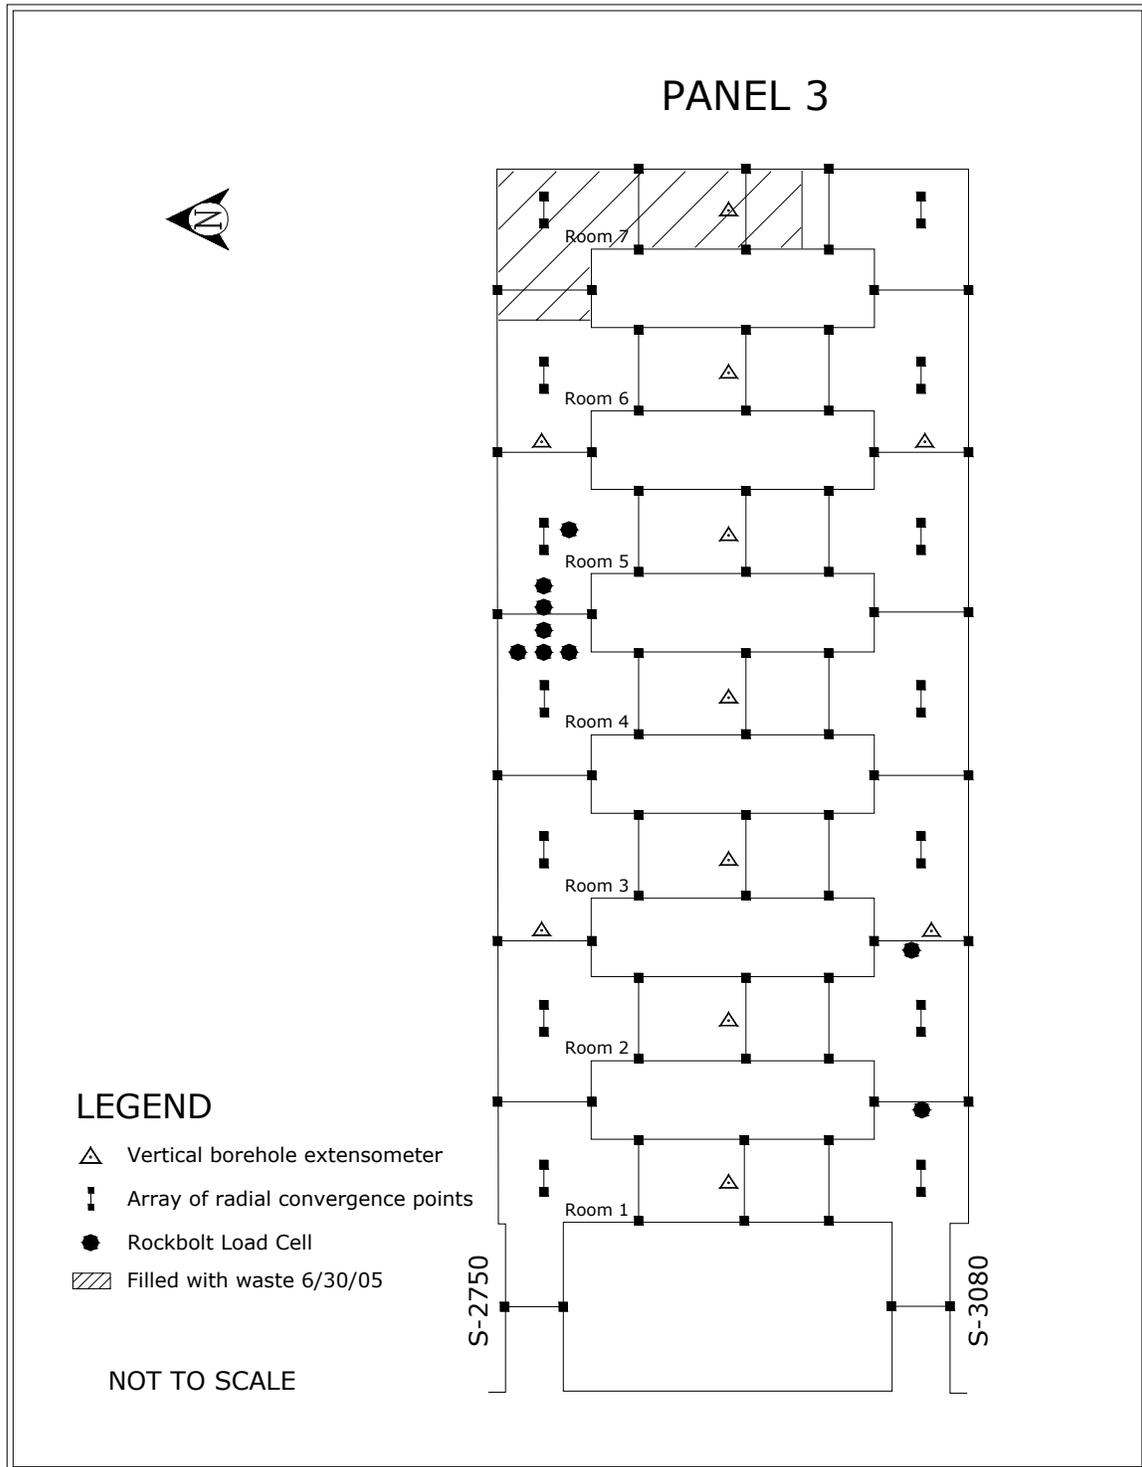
Location of Panel 3 Geotechnical Instruments
